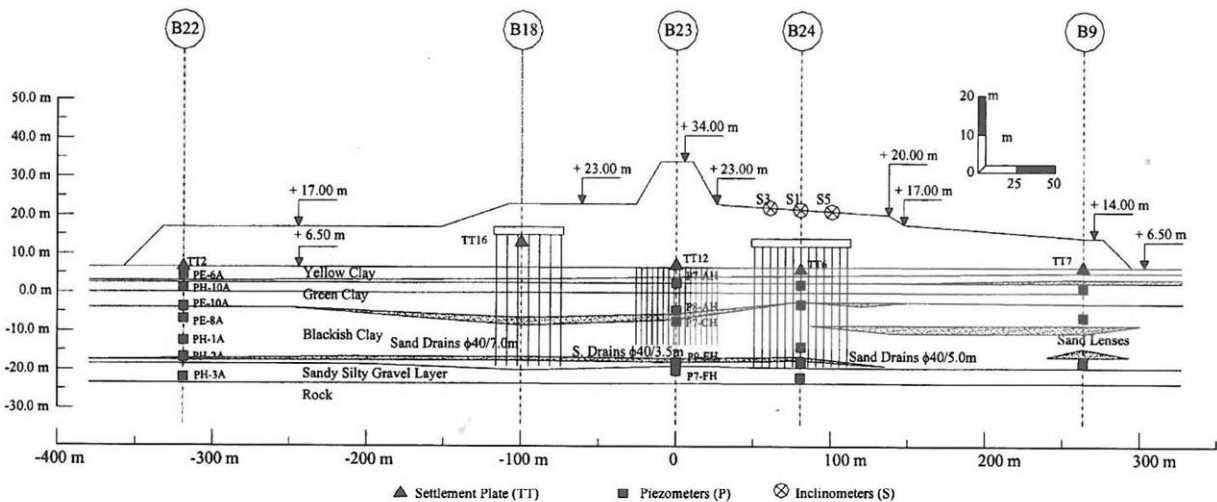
Final cross section A-A and foundation soil layers (adapted from Ozcoban et al, 2007).
